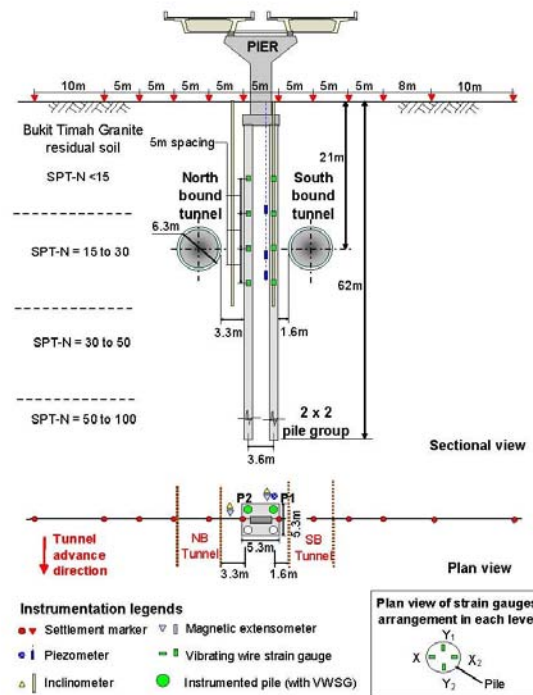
MRT NE Line C704 pile-tunnel arrangement (after Pang *et al.*, 2006)
